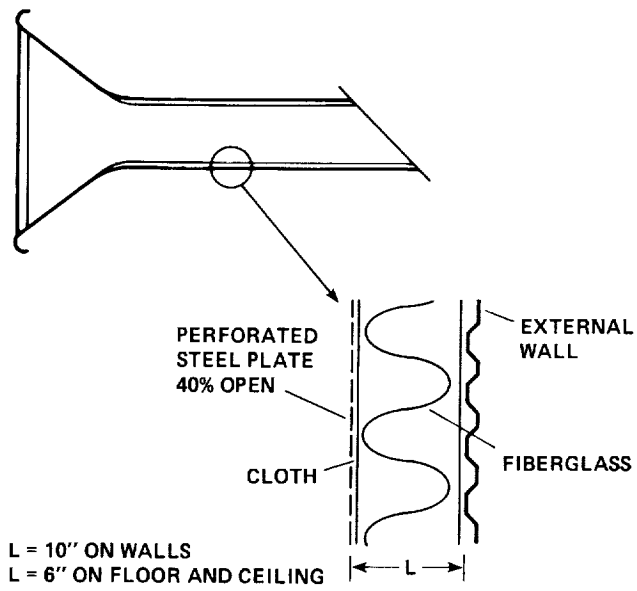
Acoustic wall lining in the existing 80- × 120-ft test section.
